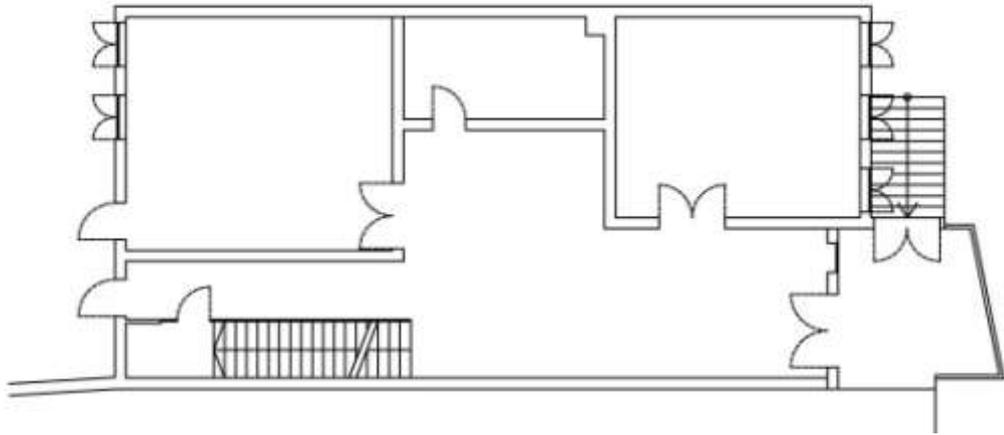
Ground (entrance) floor plan of the house at 77 lot 30 parcel
